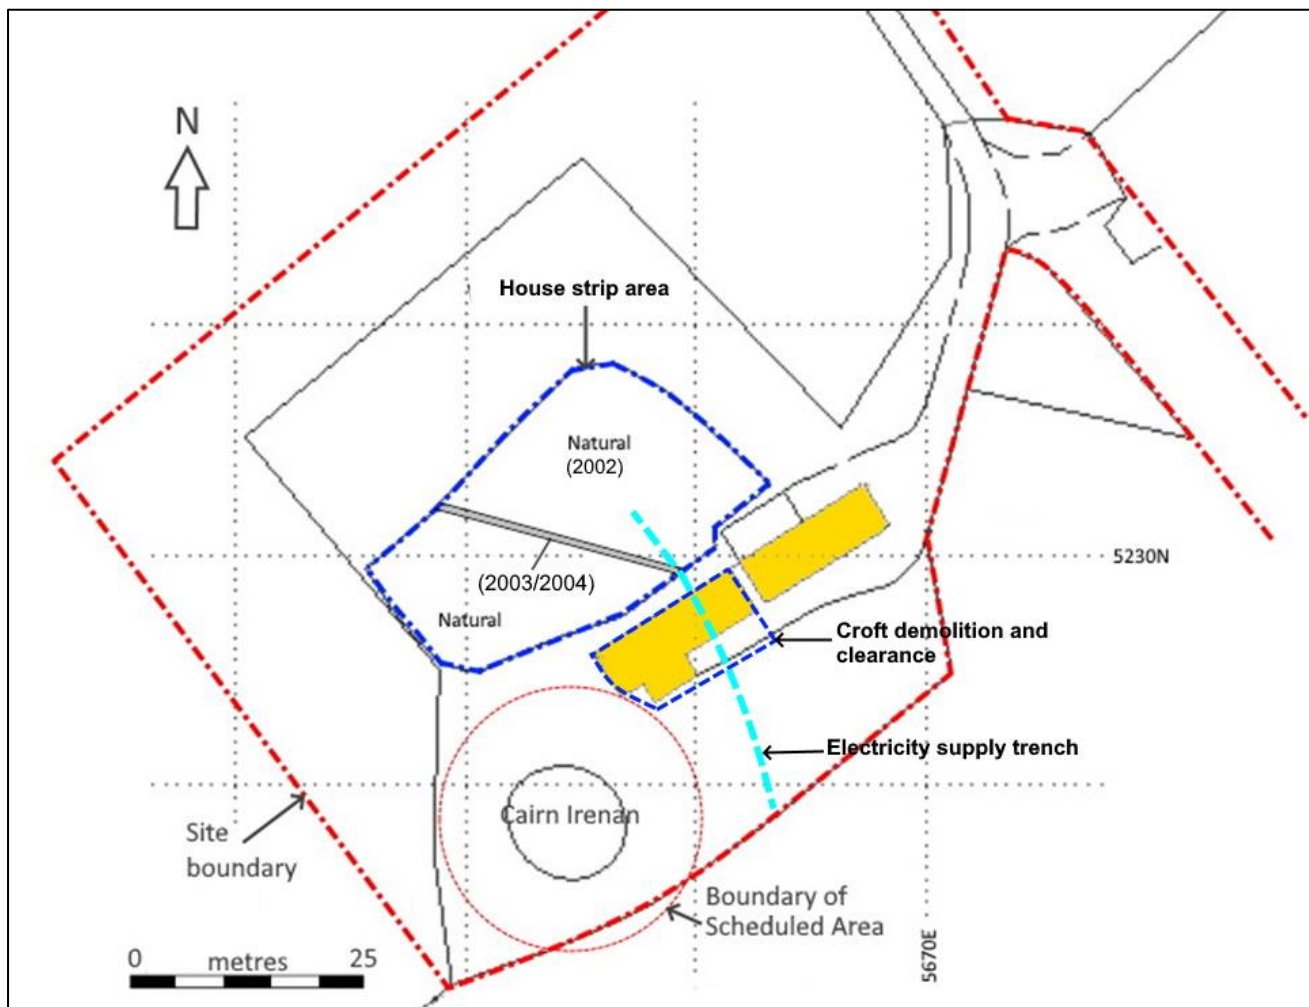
Site plan showing watching brief areas at Cairnurenan. Scale shown
